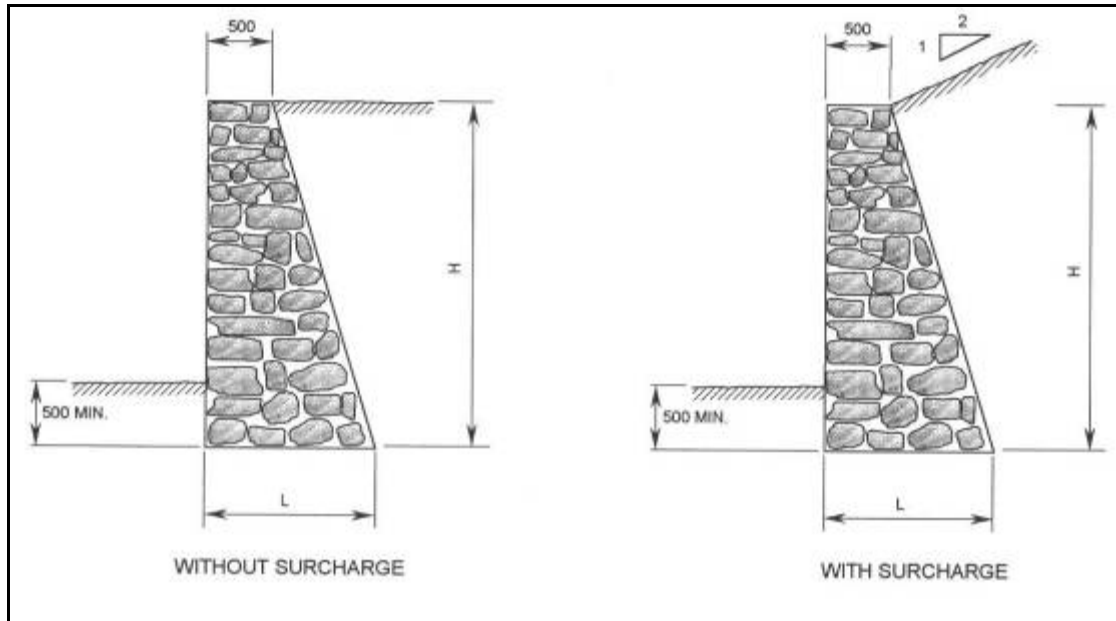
Stone, brick or blockwork wall with and without sloping backfill (surcharge)
